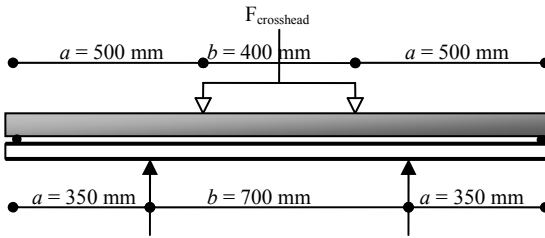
Glass beam specimens supported by HEA 100 frame.
